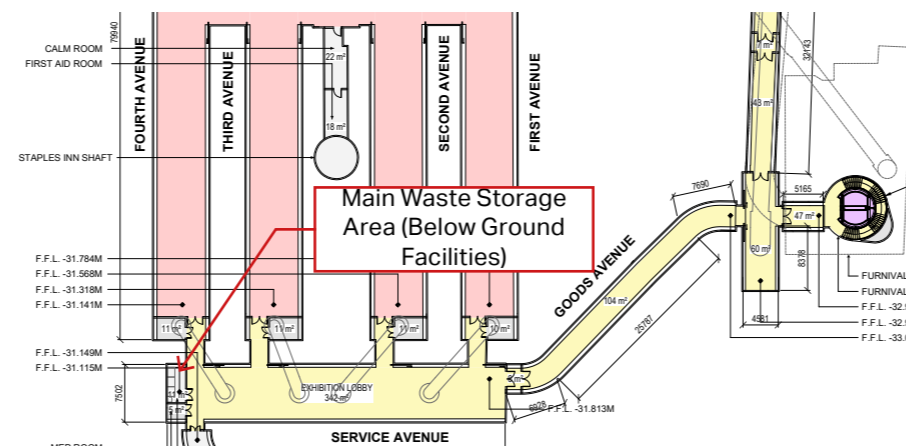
Location of the waste store for the Furnival Street below ground facilities
